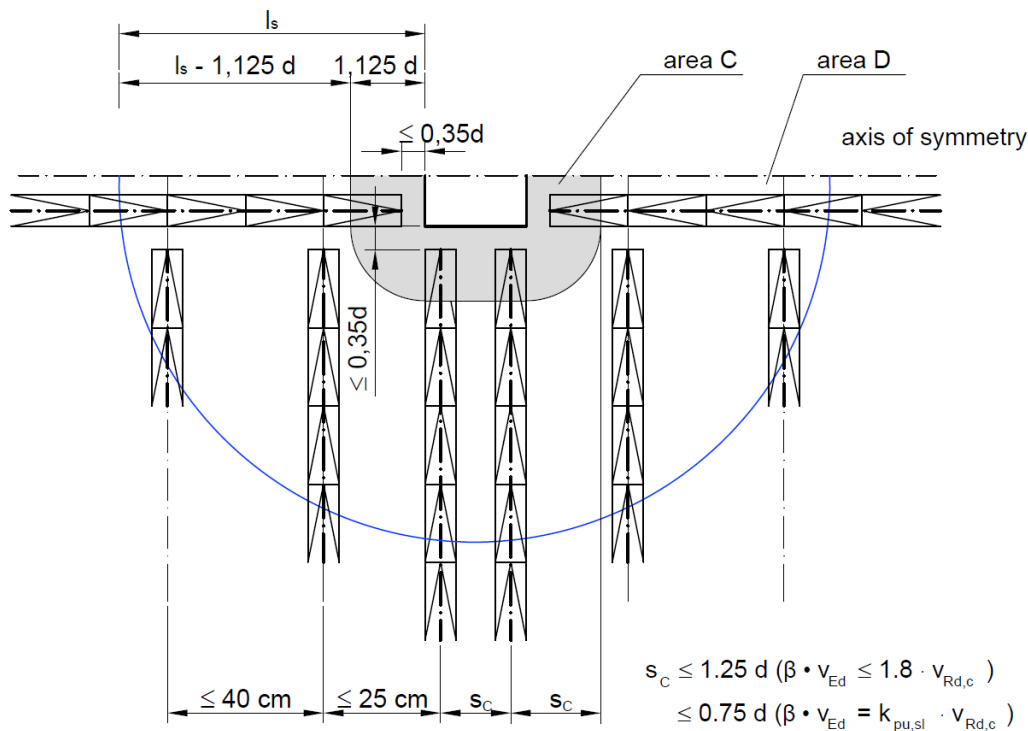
Alternative arrangement of the shear reinforcement elements in a flat slab
